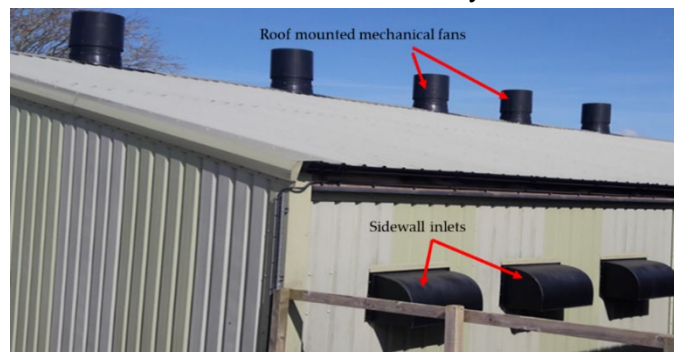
A sidewall inlet and roof exhaust ventilated broiler shed.
